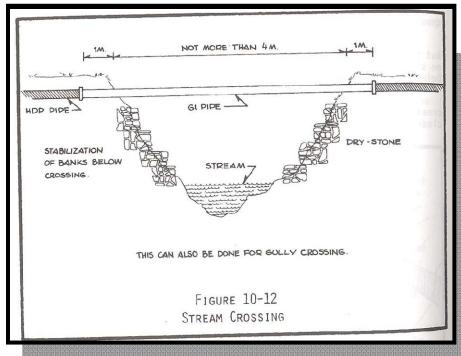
Galvanized Iron Pipe Used In Ravine Crossing (3).
